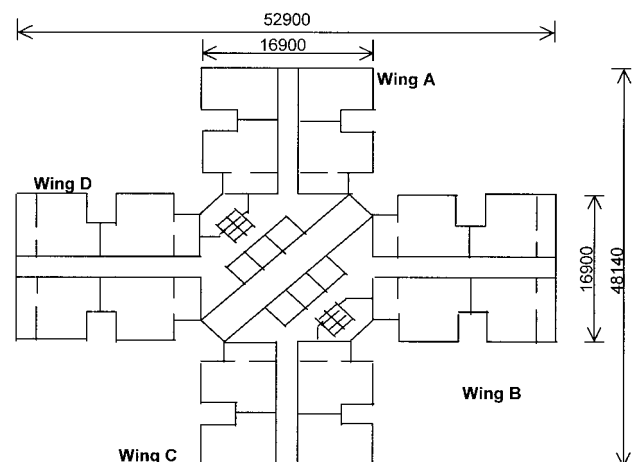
Typical Floor Plan of Harmony 1 Blocks
